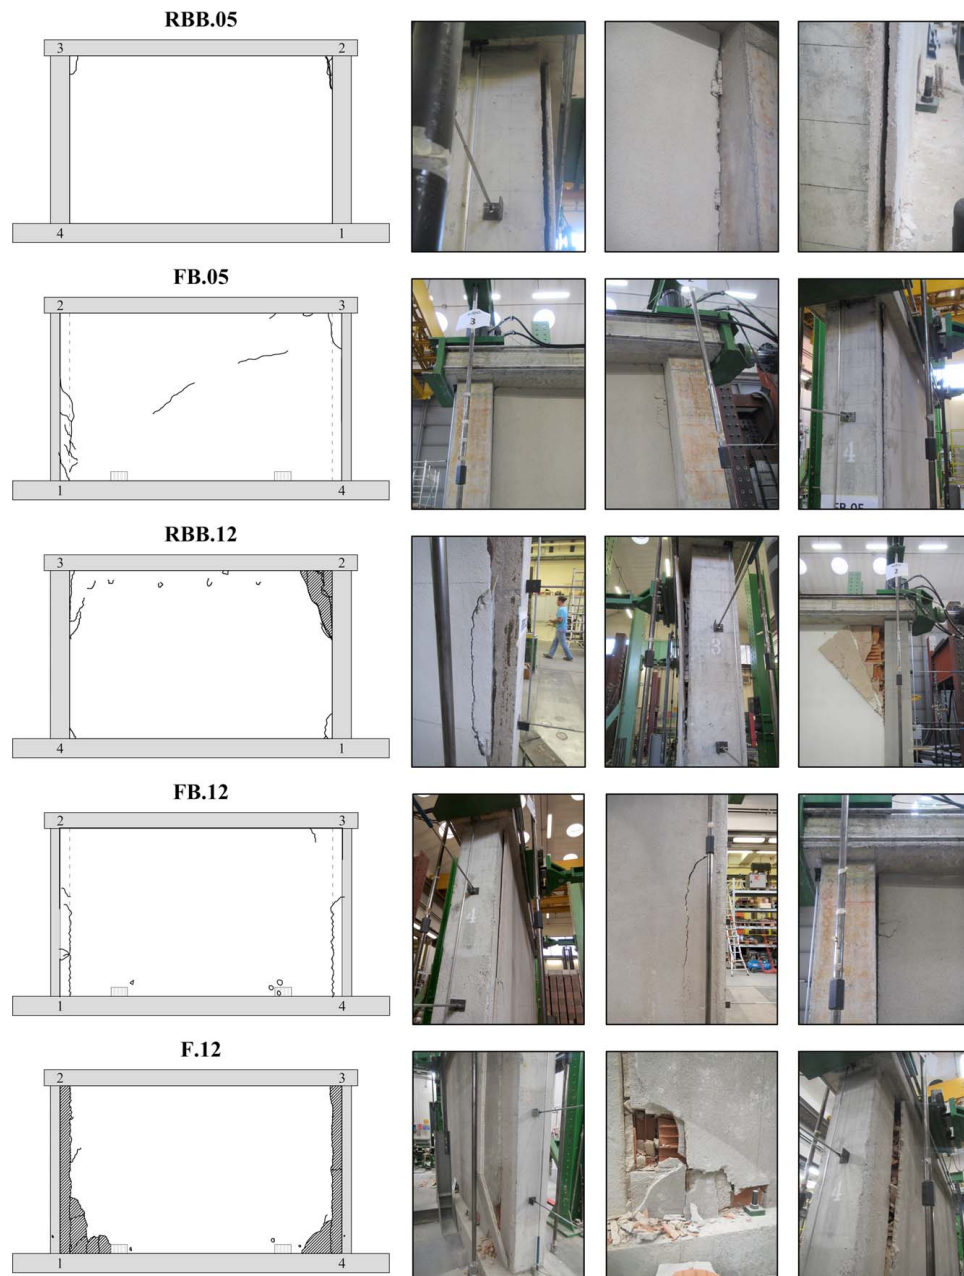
Crack pattern and view of specimens at end of IP tests.
